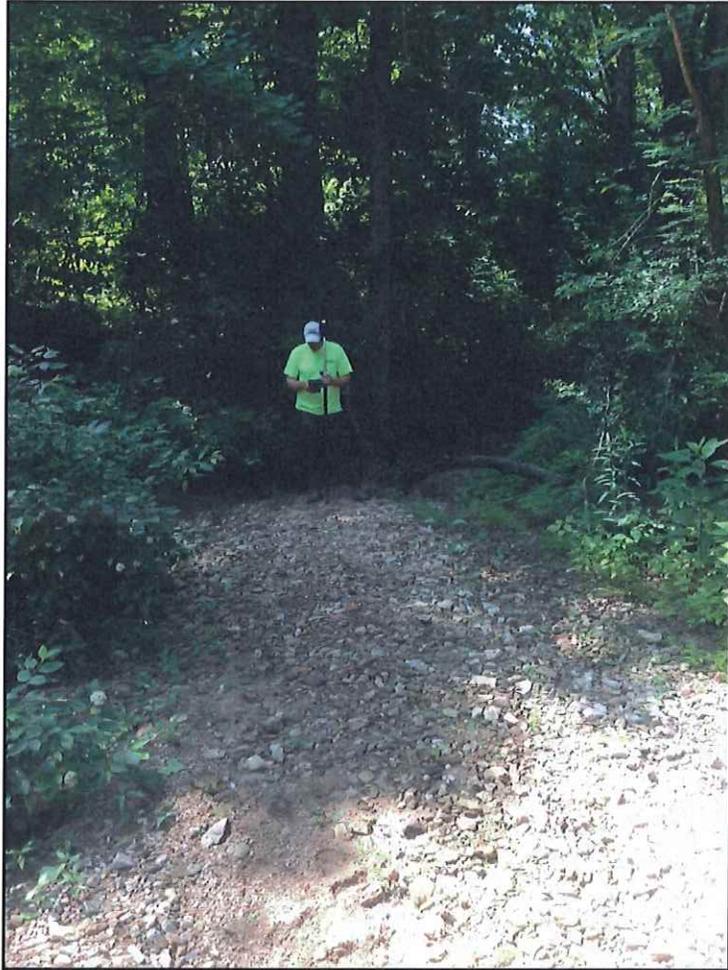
(06/24/14): Immediately Downstream of Canal Intake (Looking Downstream)
